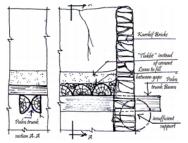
Section showing the palm tree trunks used for roof construction (After Altawil H., 1989) [10].
